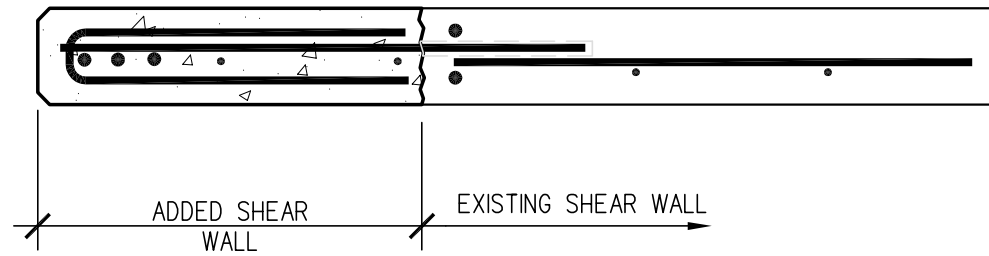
D: NEW SHEAR WALL AT EXIST. WALL
